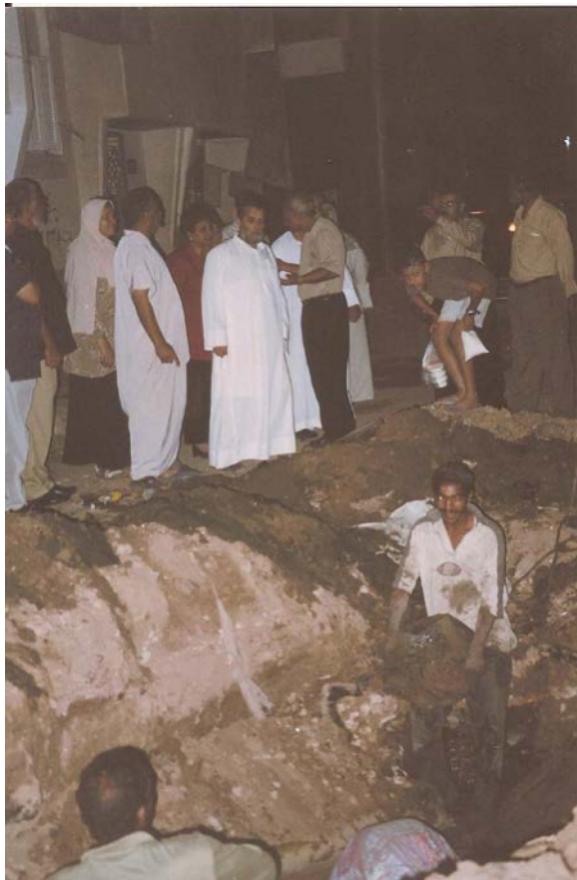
Soil Collapsing due to Sewage Problems in El-Bahtini
